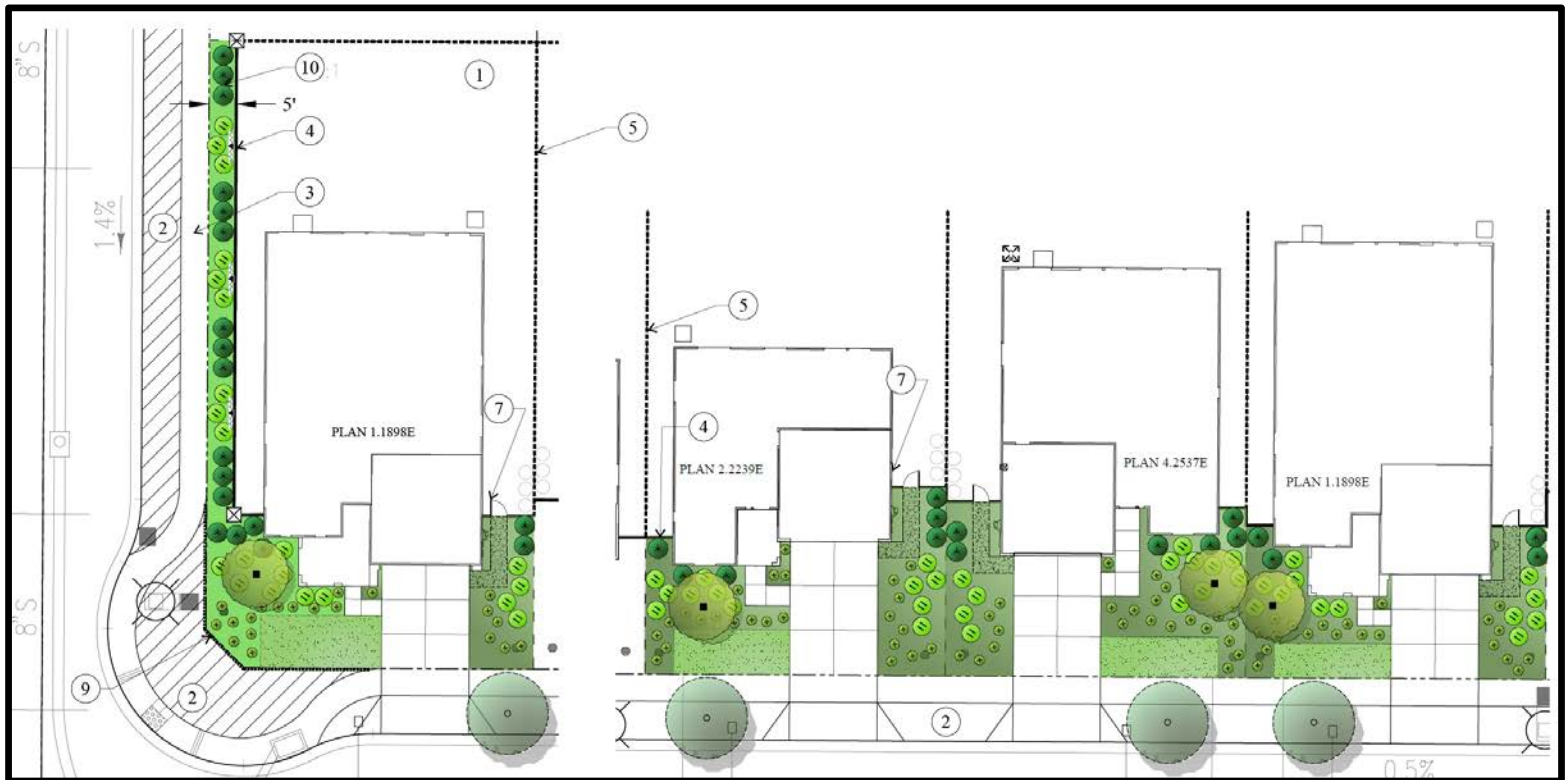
Exhibit C: Conceptual Front Yard Typical Landscape Plan – Horton
